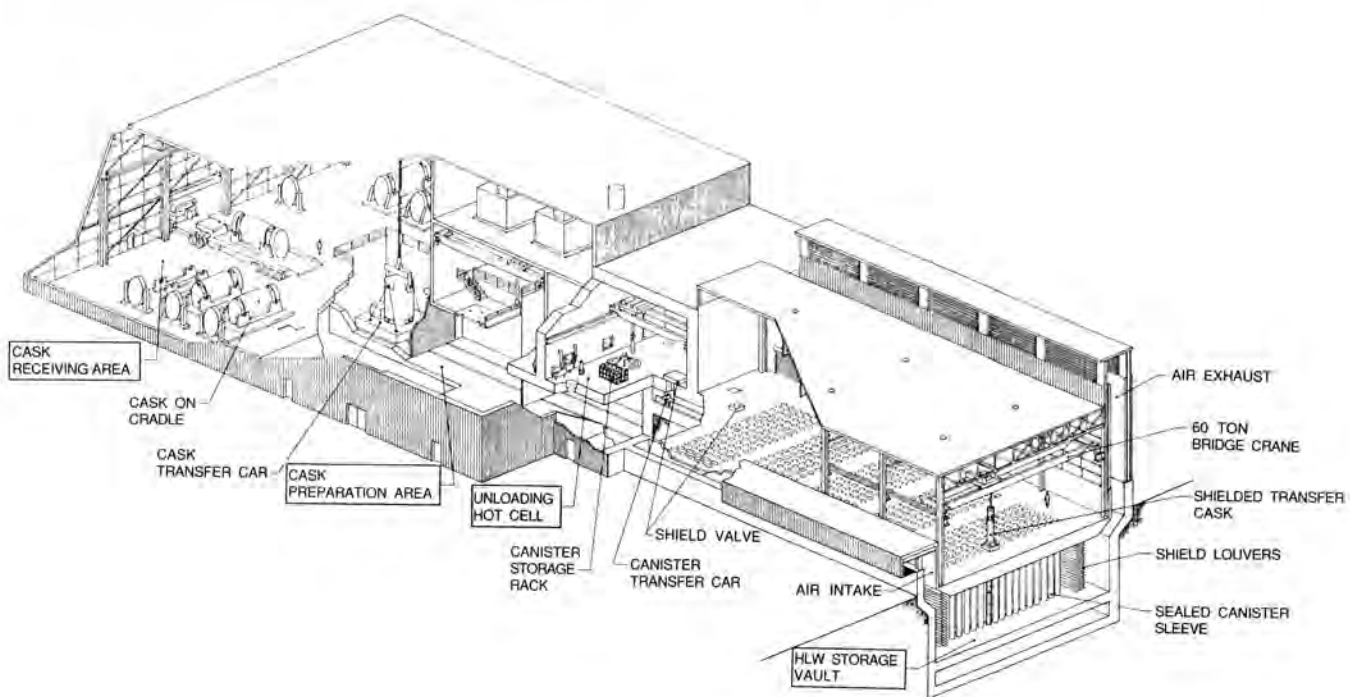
Cutaway Isometric View of the Vitrified HLW Storage Facility.
